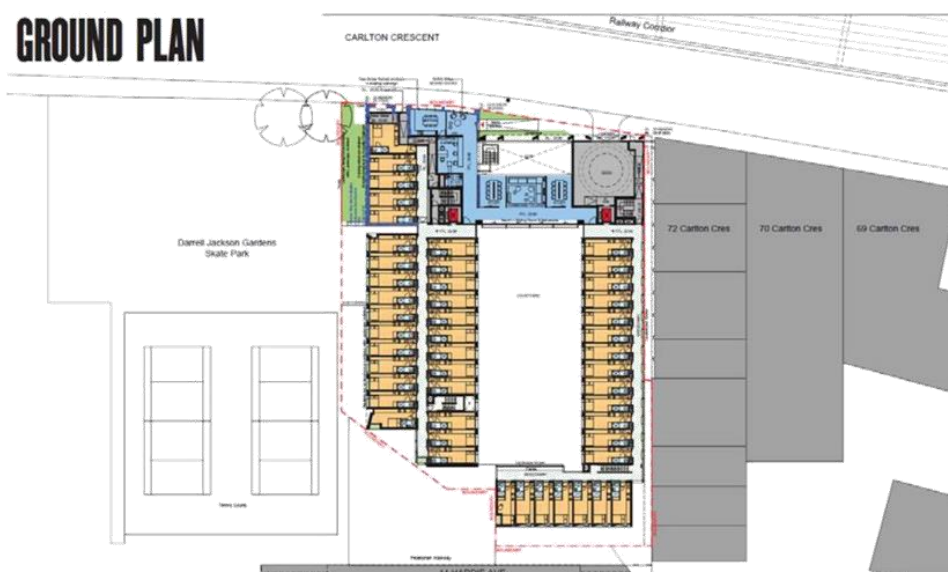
Revised ground floor plan detailing the creation of the new flood wall
